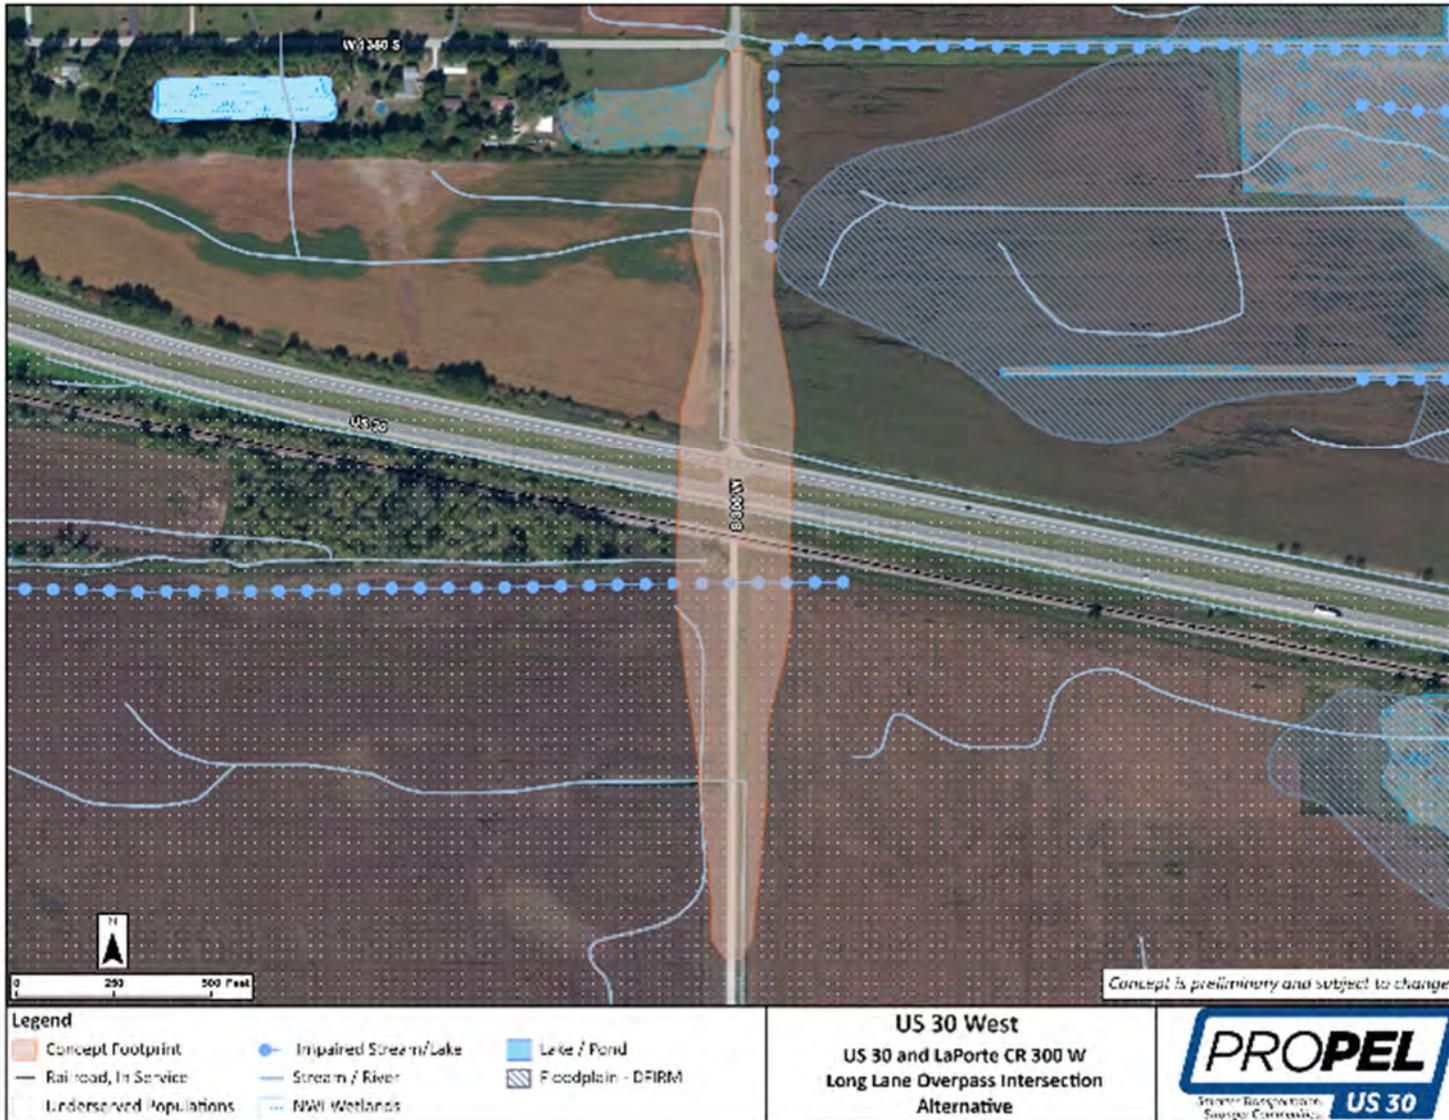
US 30 and LaPorte CR 300 W Long Lane – Cross Road Overpass/Underpass Alternative – LaPorte CR 300 W Over US 30
